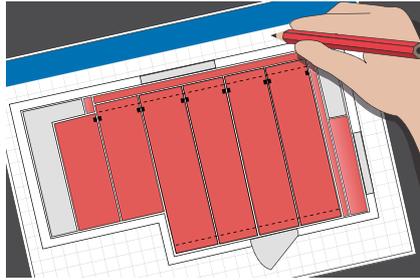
Connectors along bottom wall and place for thermostat installation is bottom-left corner of the room.
